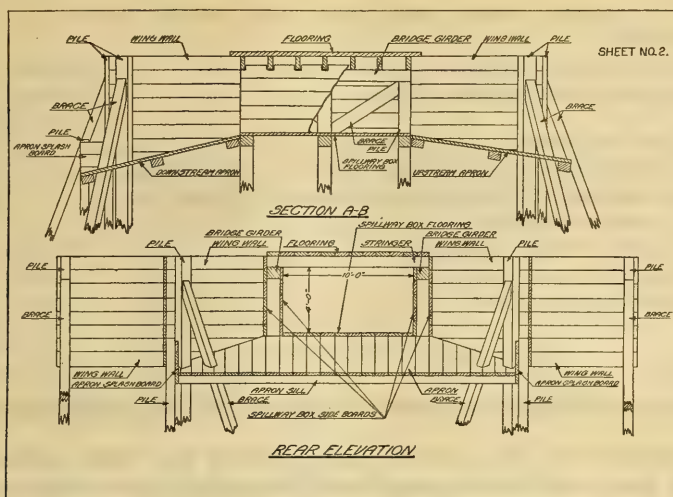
Plan of Hecla Dam, Bayou Walnut, Mound, La., 1915.
